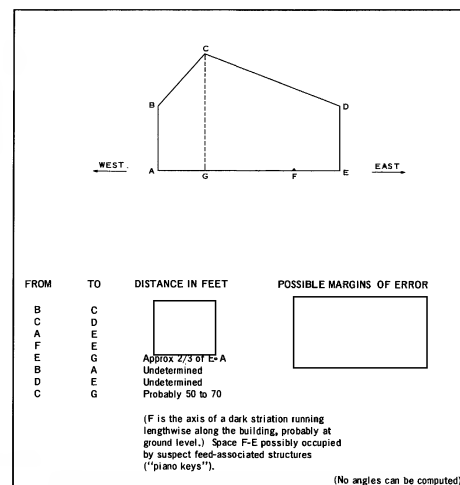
SIDE ELEVATION OF HEN HOUSE A-1, ANGARSK
